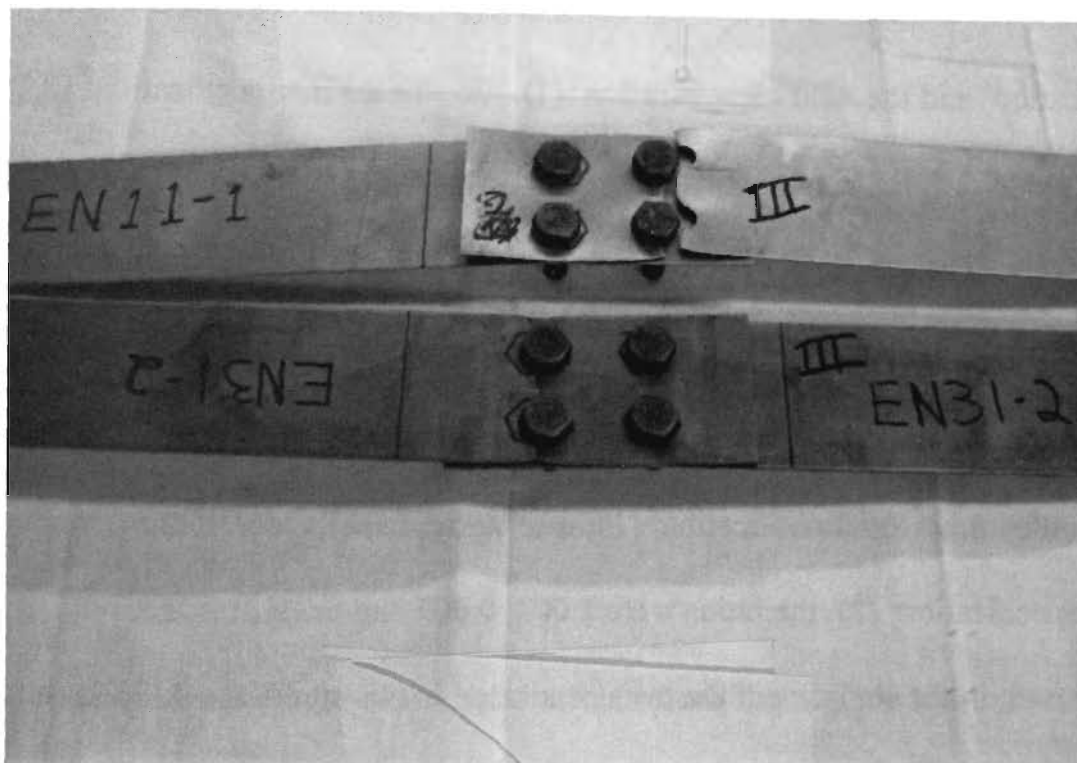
Photograph Of A Typical Test Assembly Failing By Type III Failure Mode (Type E Specimens Shown).
